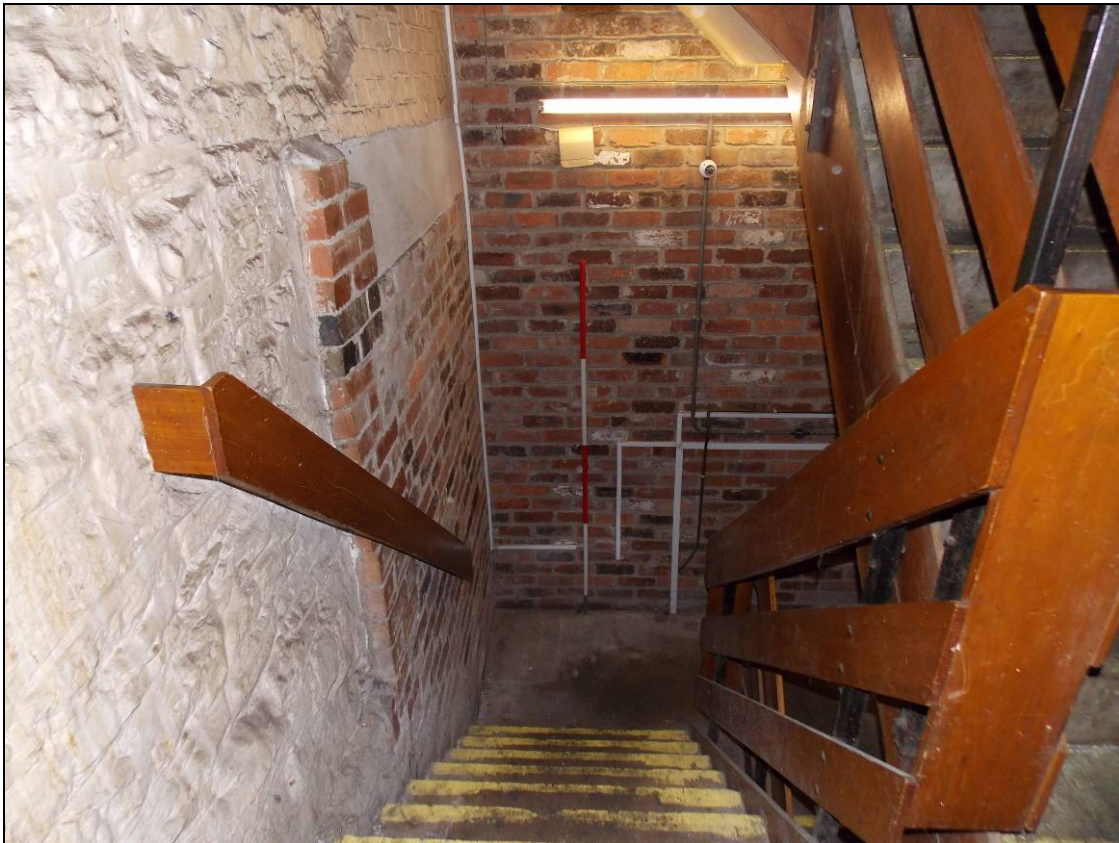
Staircase to the basement of Building A, looking south (scale 2m).
